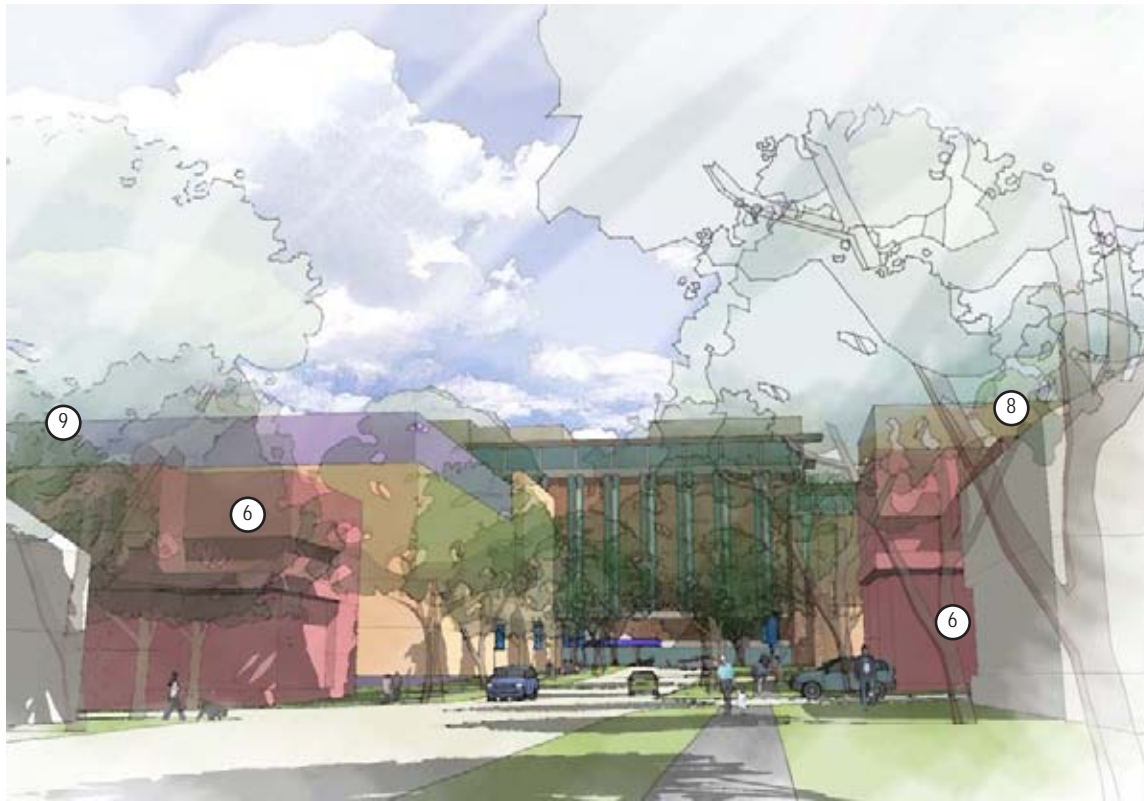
Street level view of Mound Street, West of Mills Street, showing possible development massing.
